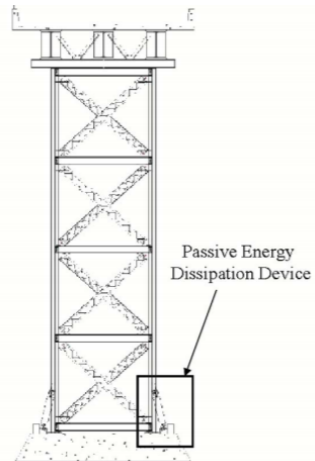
Retrofit bridge pier with energy dissipating device (Pollino and Bruneau, 2007)
